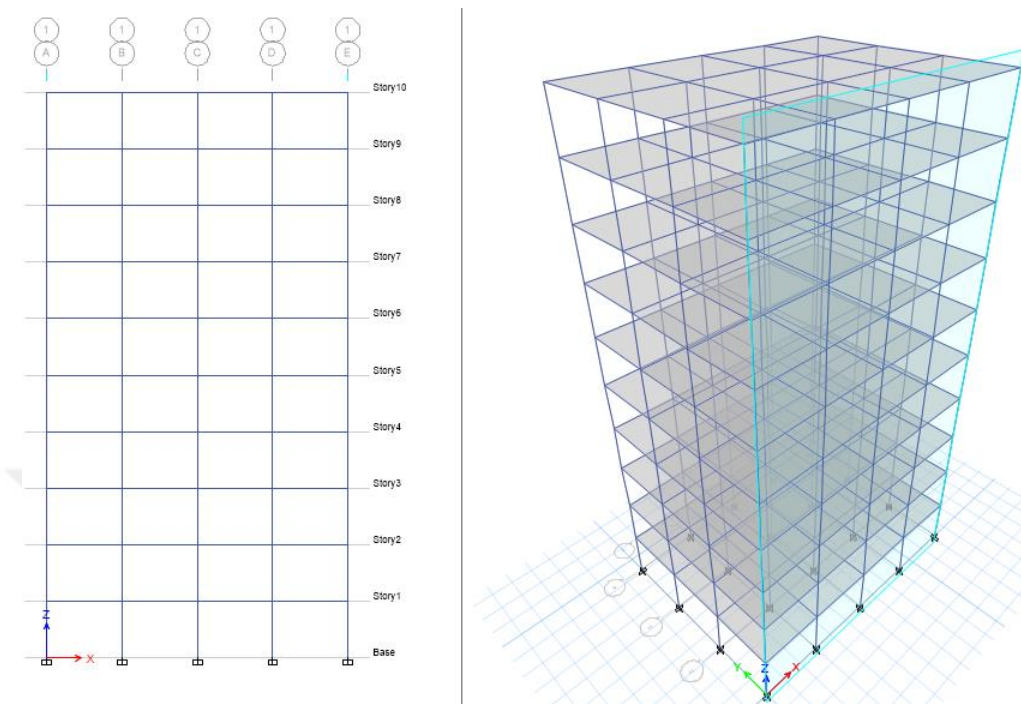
The 10-story building with moment-resisting frame and without shear walls.
